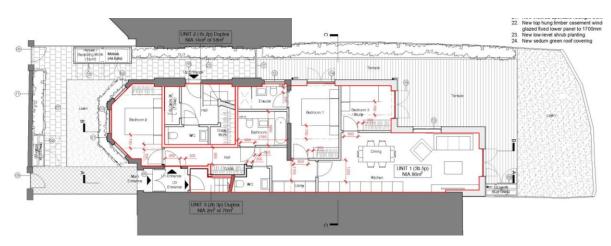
Extract from drawing dMFK 2039 A100 P5
